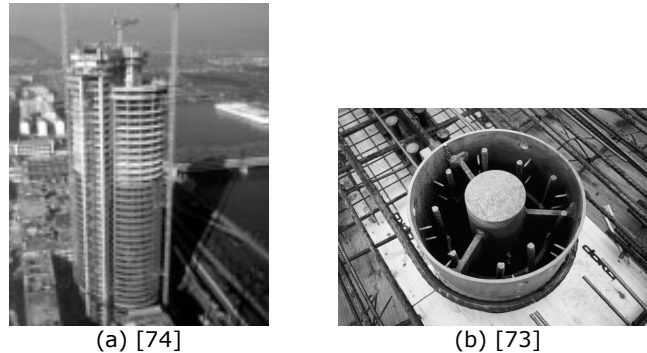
Millennium Tower in Vienna (a); Cross section of column (b)
